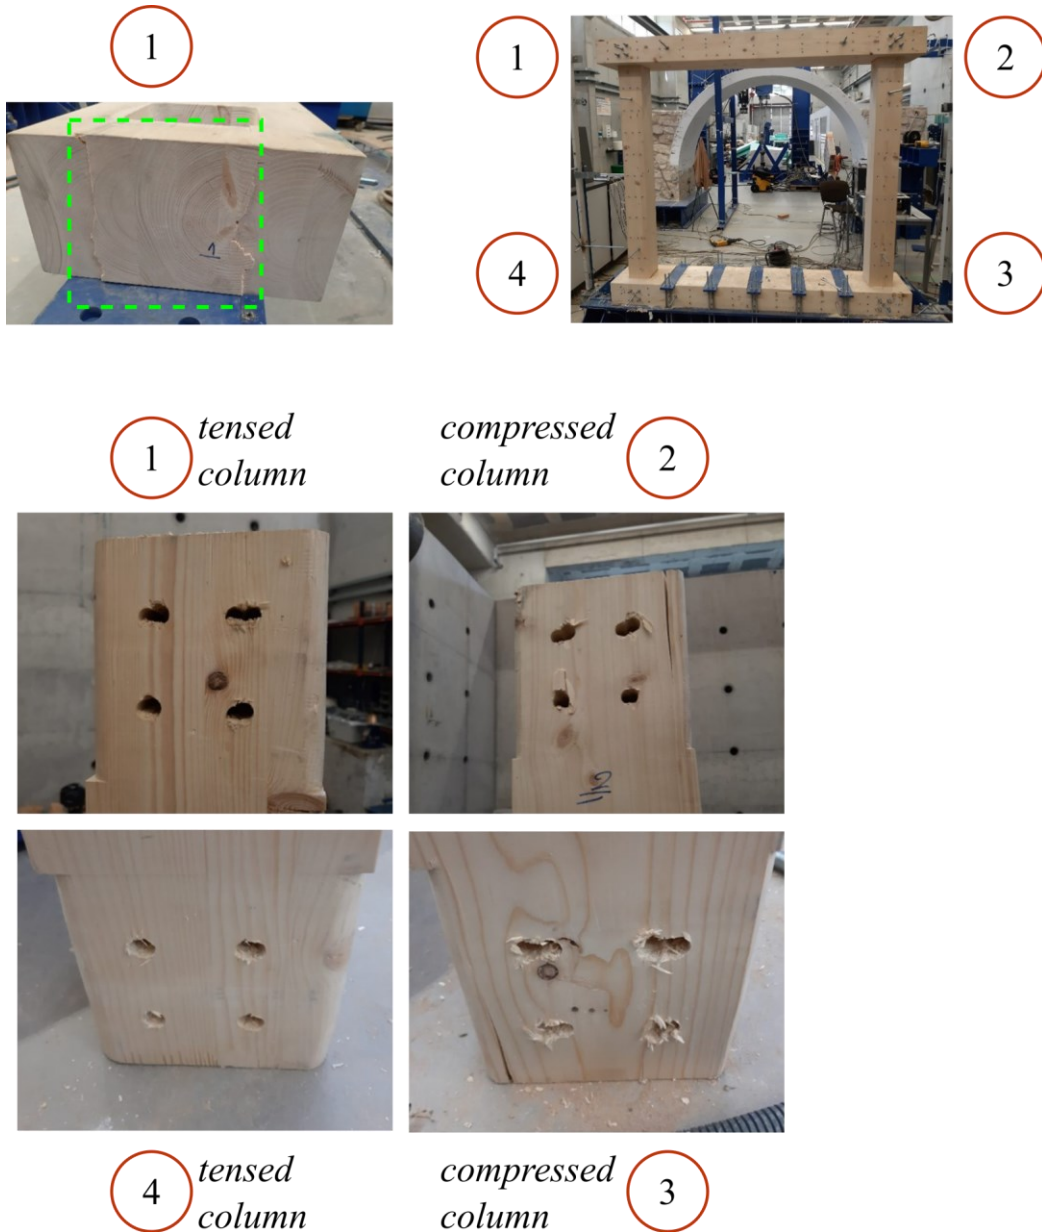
TF3 test – Highlight of the damage in the top beam and joint holes of the timber columns.
